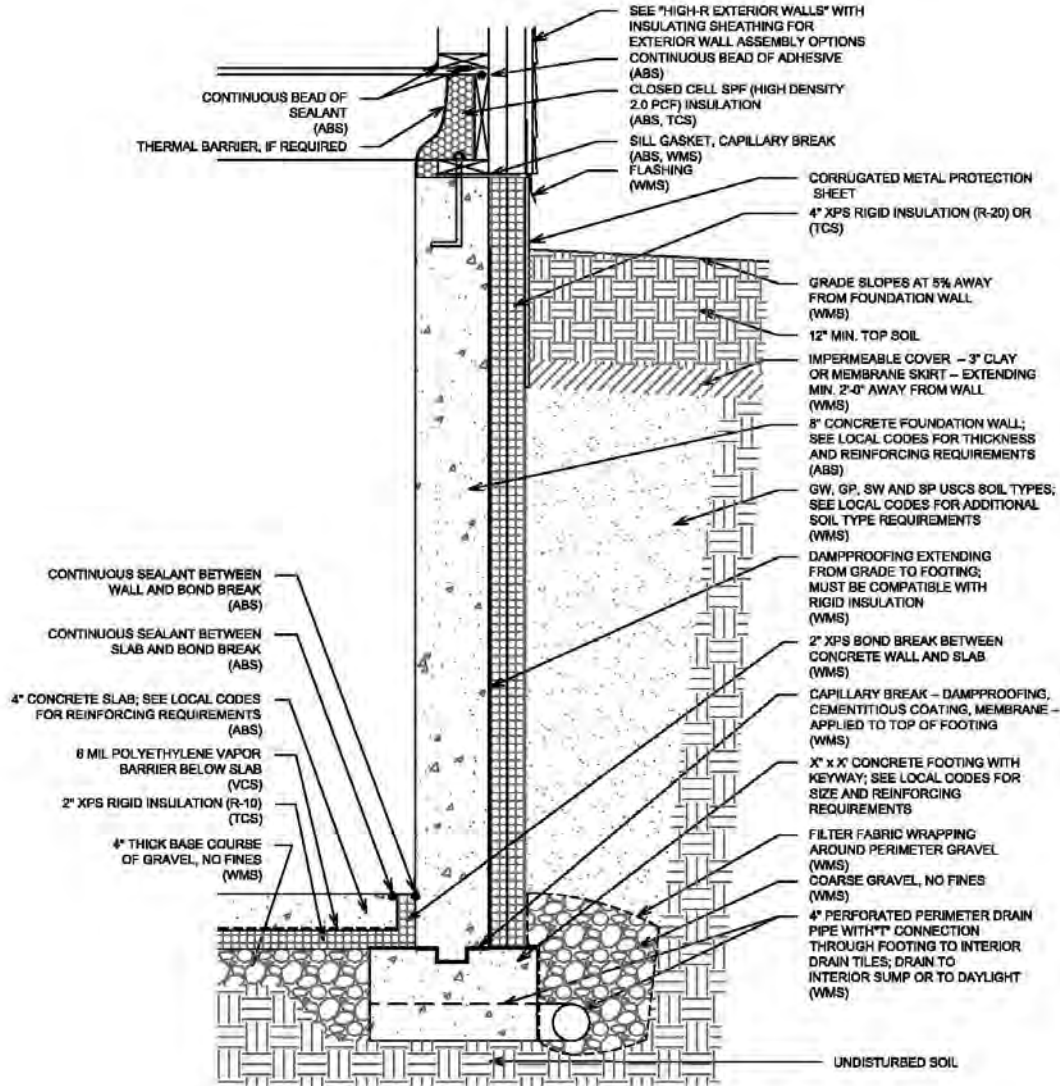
Case 11 Detailed Drawing – Recommended Foundation Wall System
